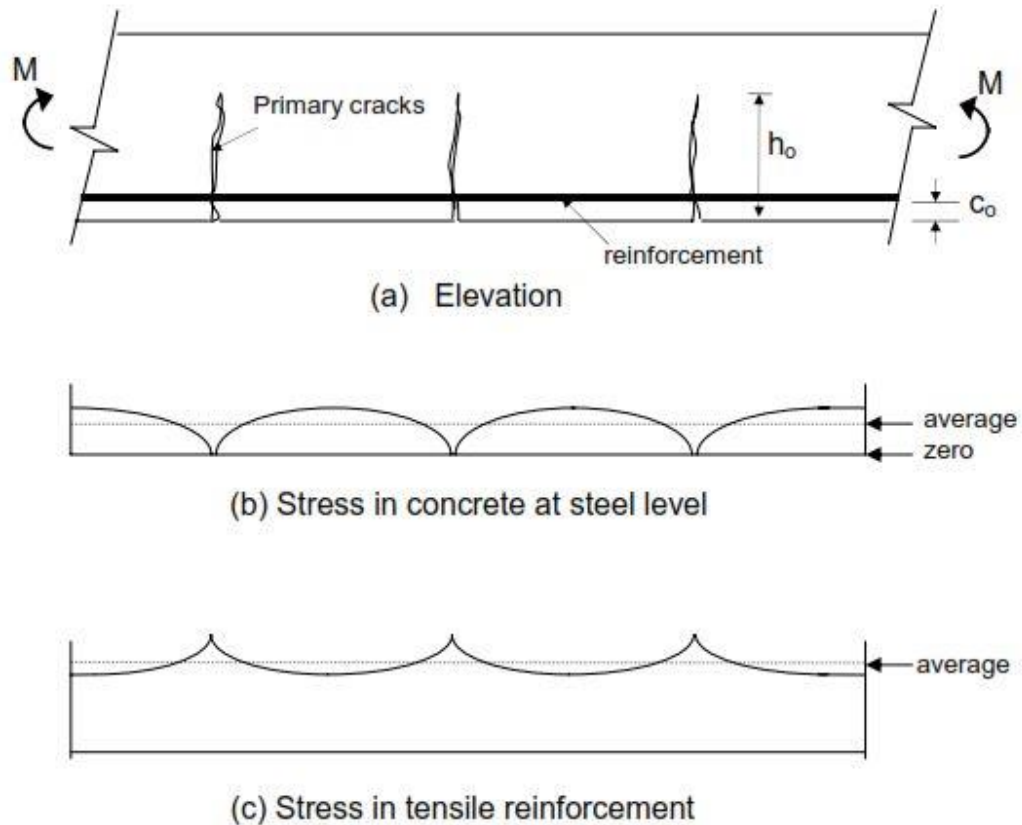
2 Stresses at steel level in a cracked reinforced concrete member (S. Nejadi, 2017)
